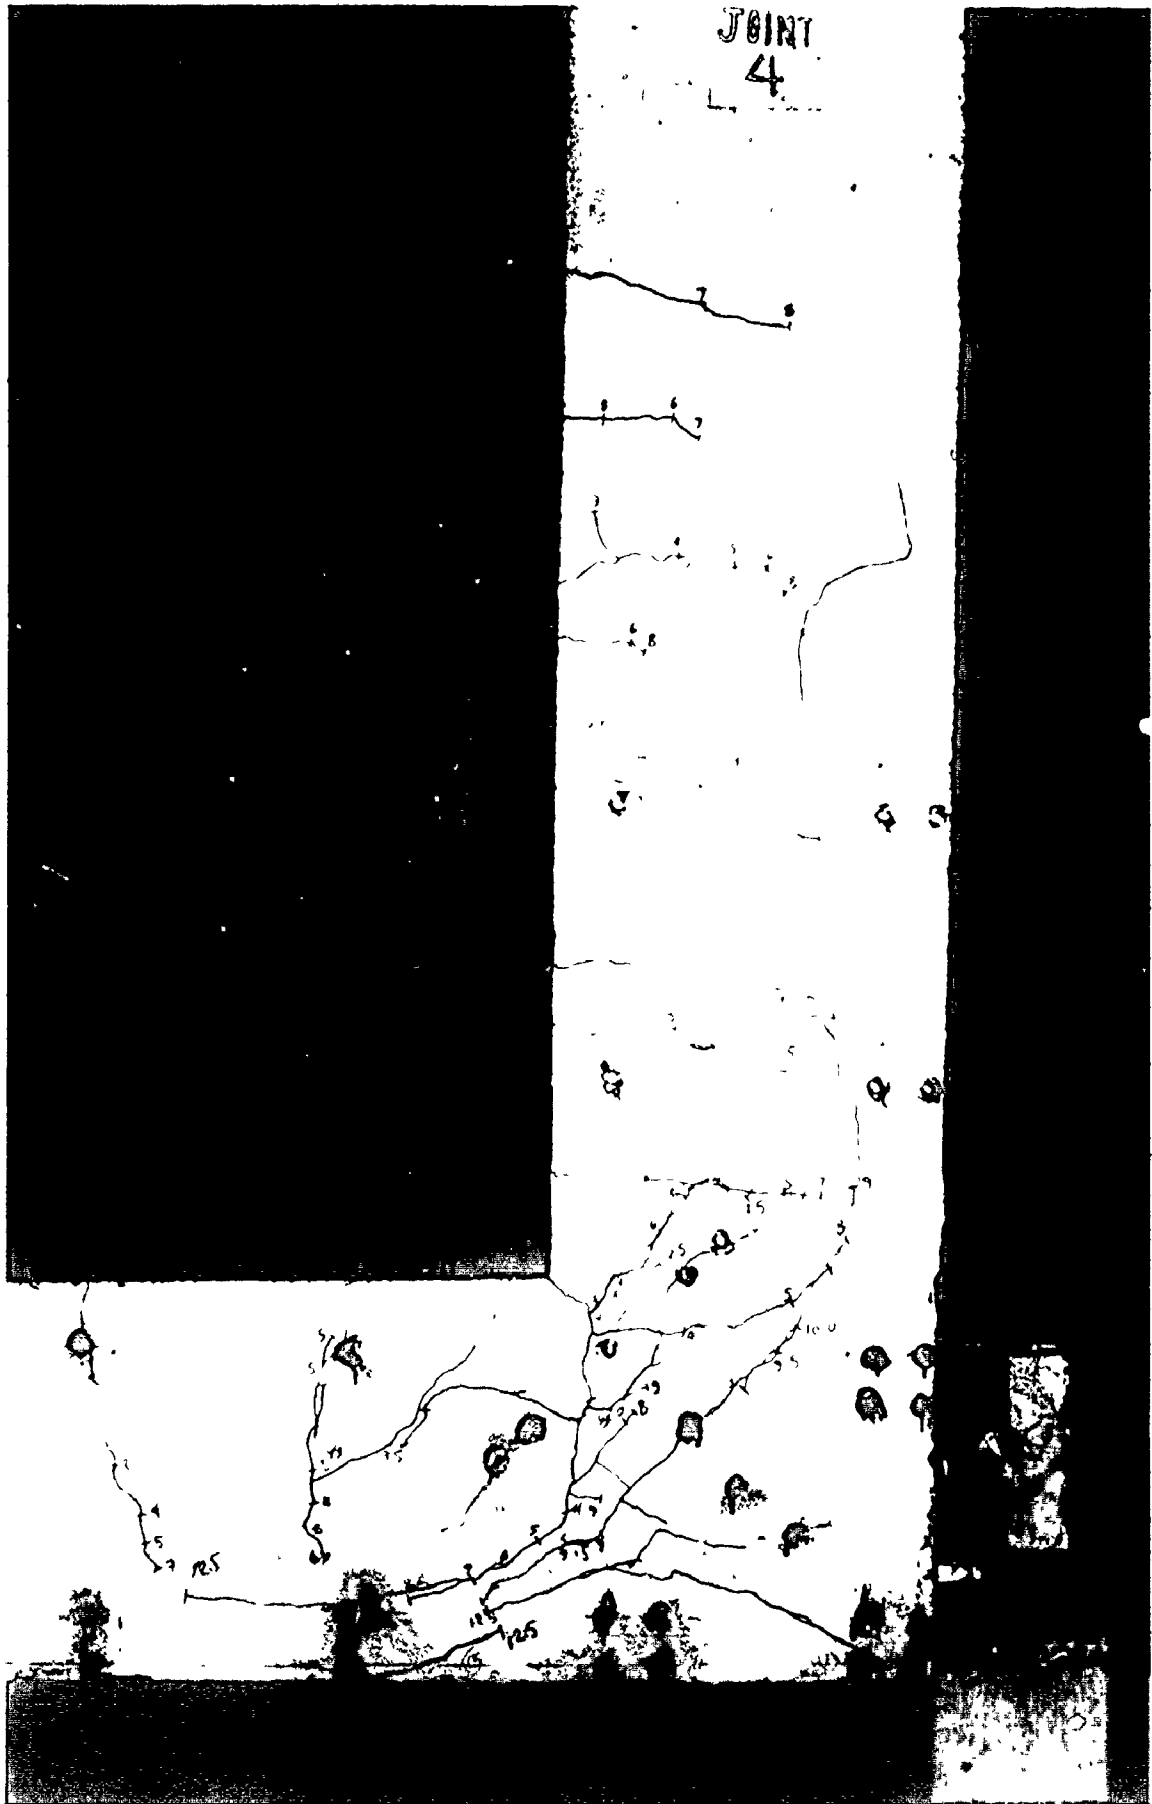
JOINT DETAIL (4) AFTER FAILURE
